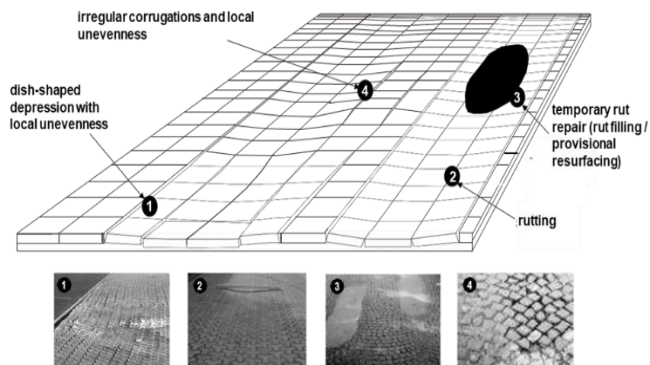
Types of settlement in pavement structures made of cobblestones and slabs
